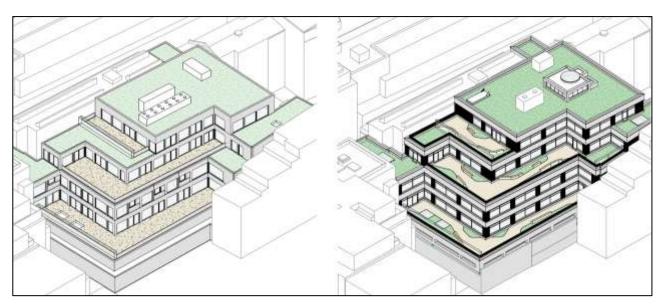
Layout of the rear of the building as approved (left) and proposed (right)
